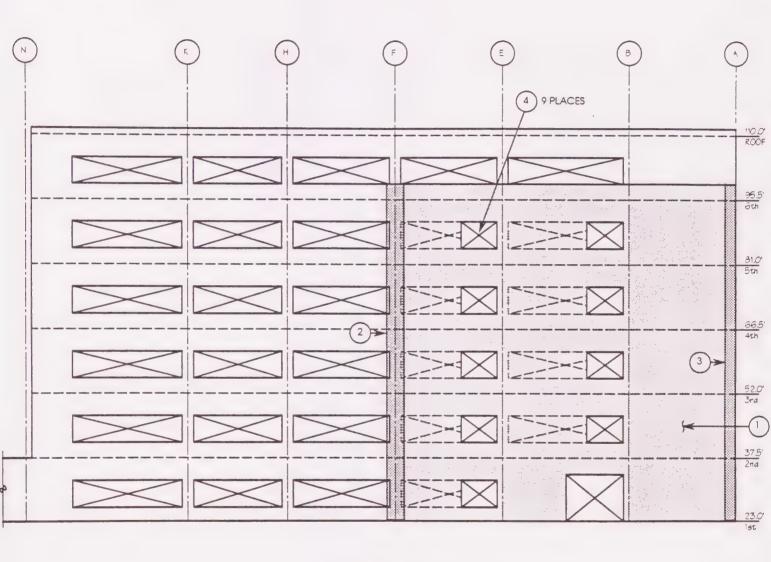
Retrofit Scheme - East Tower Wall Elevation
